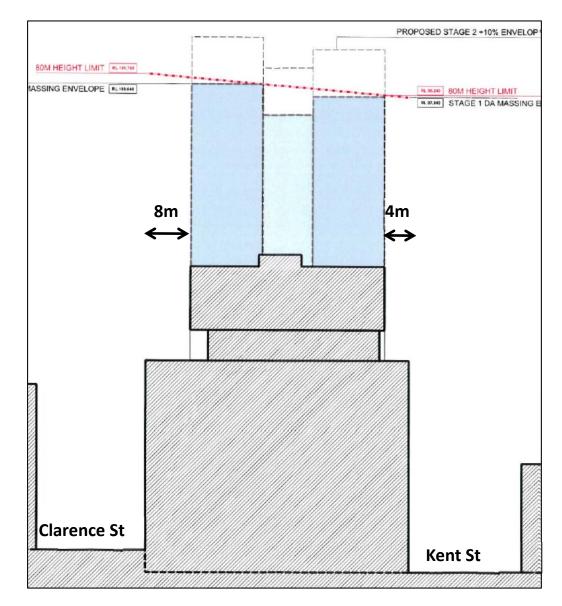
Section of Stage 1 building envelope illustrating approved setbacks above podium/street wall height
